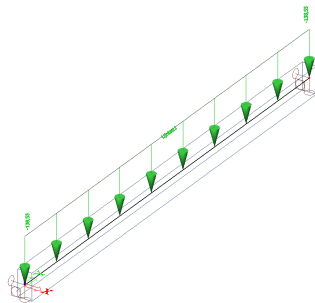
Beam model of the flexible side girder with self-weight of concrete floor girders
